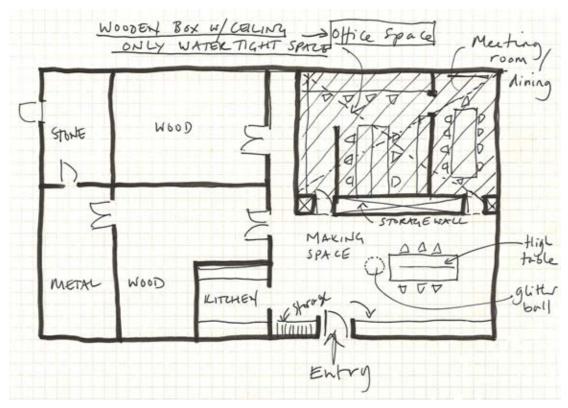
'Indicative Sugarhouse Studio ground floor plan'. (Furniss, 2016).
